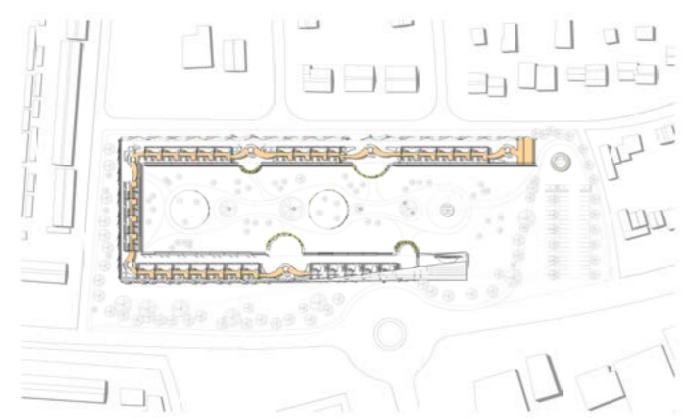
Mez floor - circulation areas leading to 1st floor
